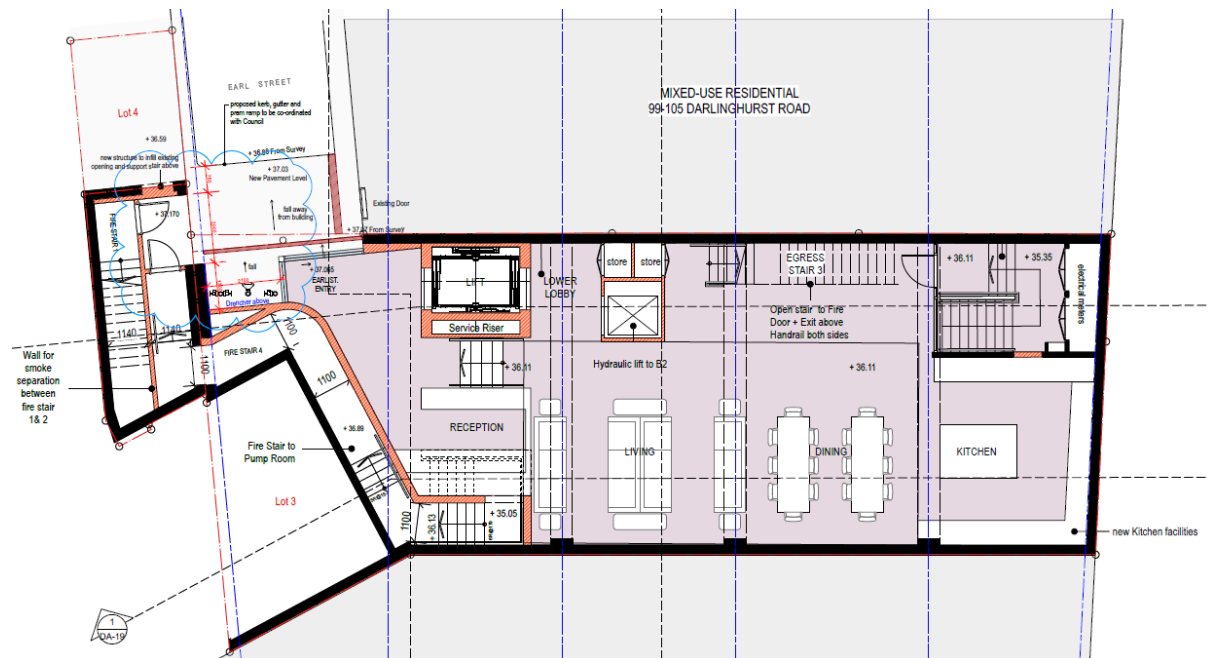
Proposed lower ground floor (Earl Street level) plan / Basement 1
